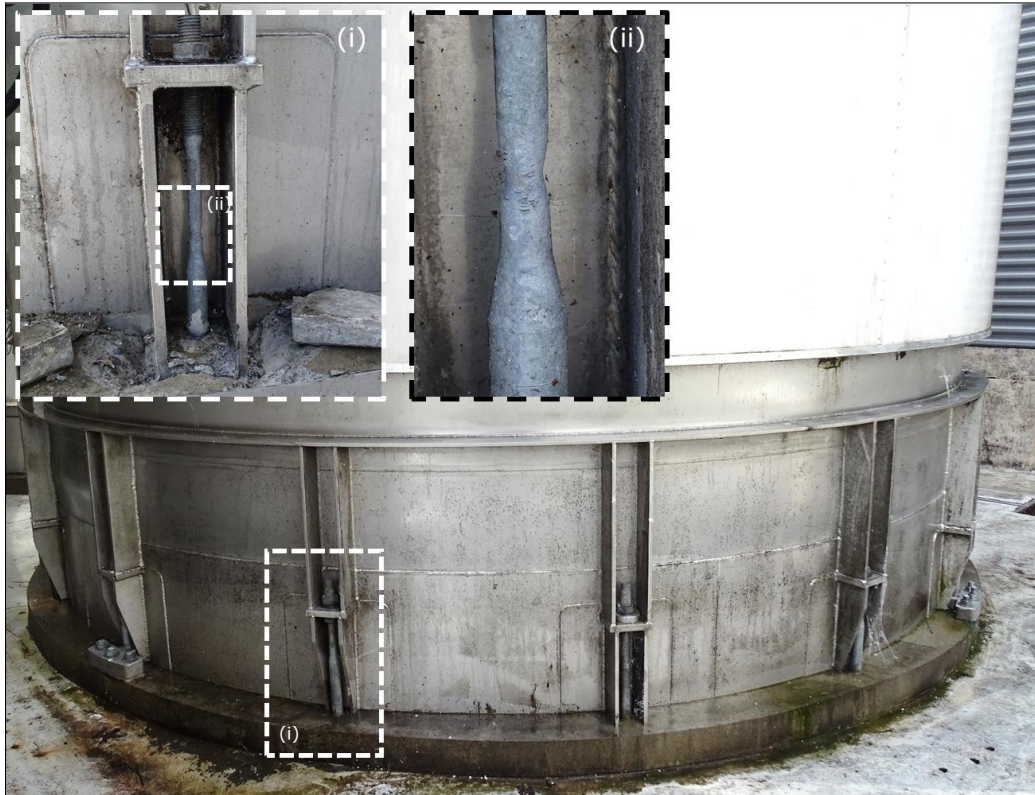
Tank skirting strengthened using extra welded stiffeners and addition of a concrete nib following the 2013 earthquakes; (i) close-up of the anchor connections showing crushing and spalling of concrete at base; (ii) close-up view of cup-and-cone yielding of the fuse rod (0.13g hPGA).
